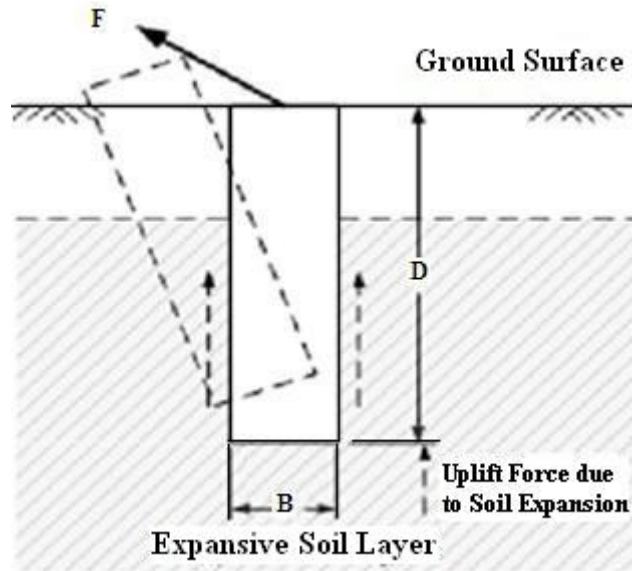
Failure Mechanism of 3-Cable Median Barriers Built in Expansive Soil
